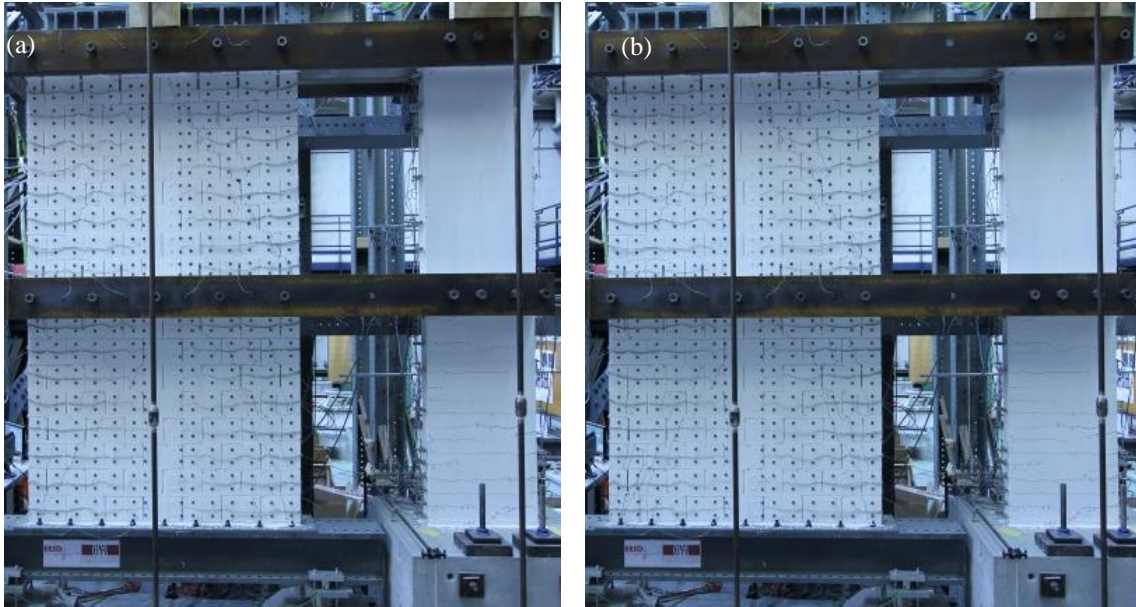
Specimen crack pattern at LS27, $\delta = -0.3\%$. Before (a) and after (b) the horizontal load failure.
